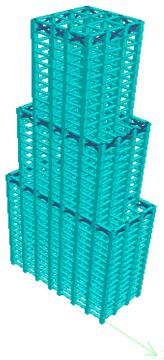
Geometric vertical irregular G+35 Building with outrigger Braced system elevation
